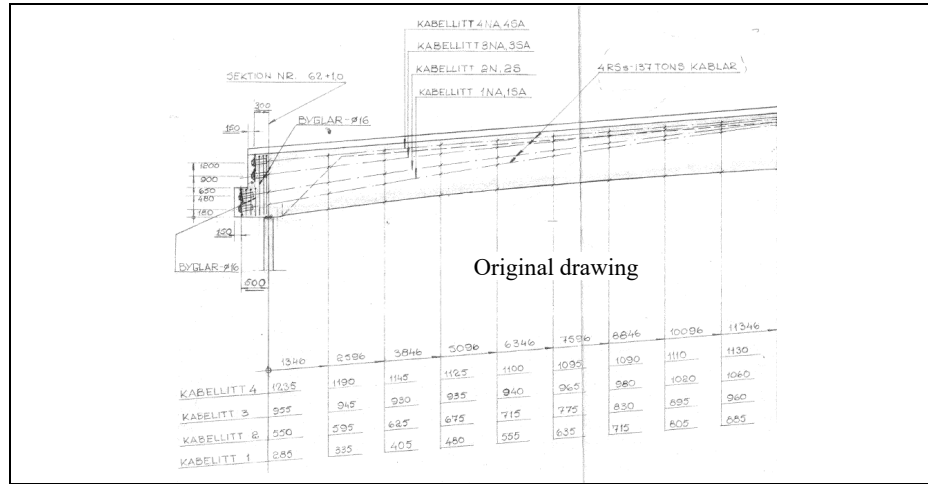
Inspection of ducts in the north/south girder, Location A
